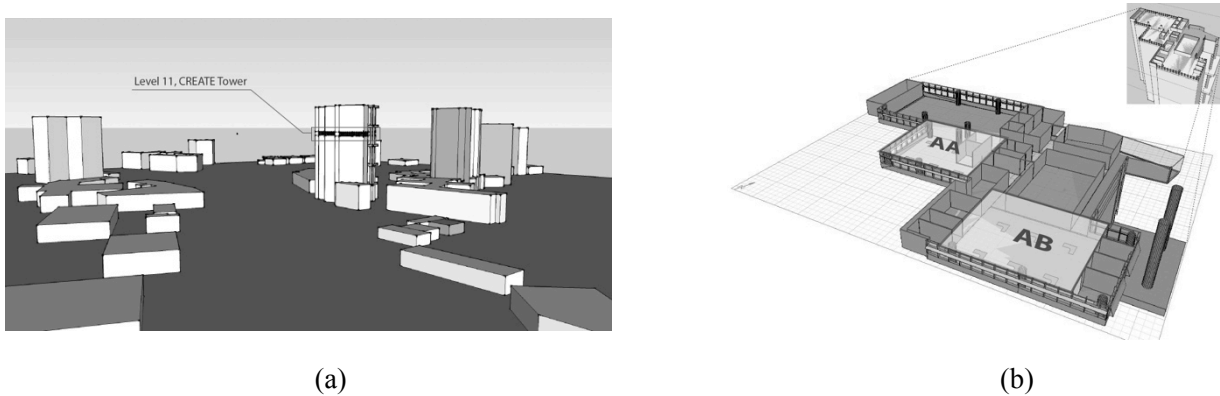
(a) Site location and the surrounding urban context; (b) perspective of AA and AB in CREATE Tower
